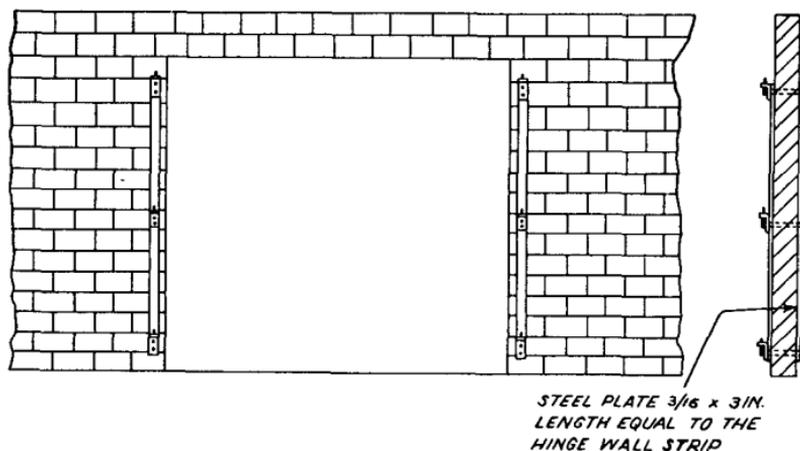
Concrete block wall prepared for doors swinging in pairs — lap mounted.
